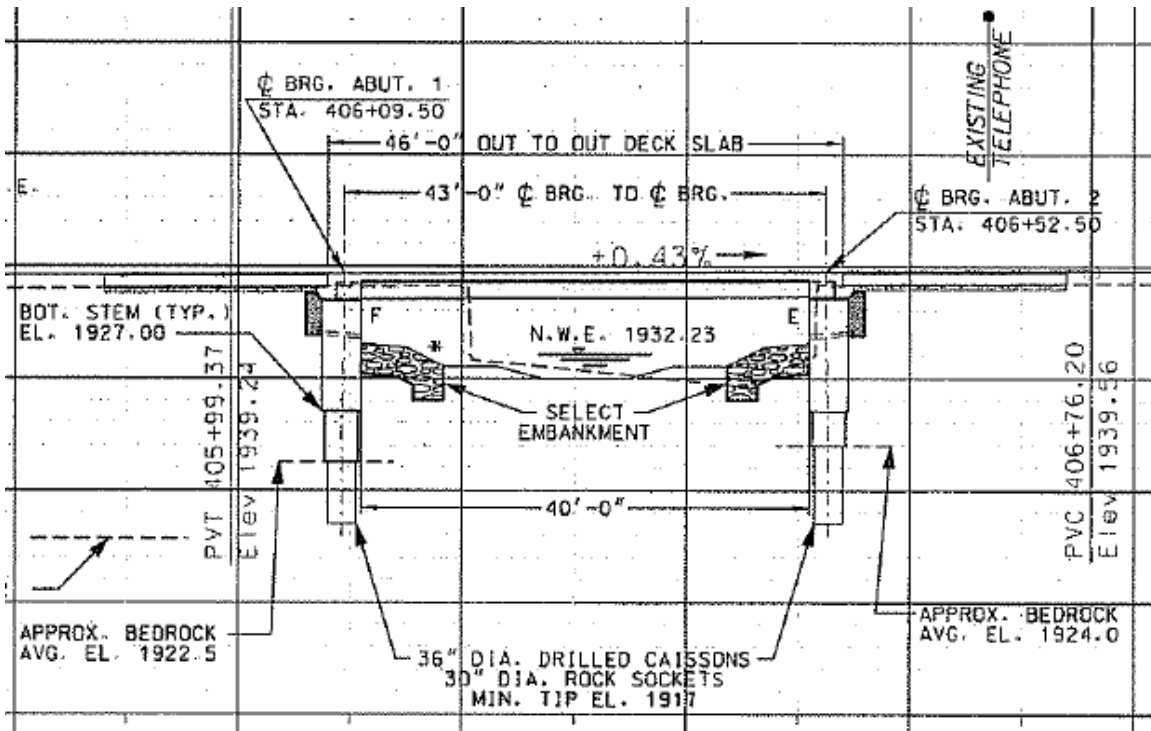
Profile of Stalnaker Run Bridge replacement, as indicated in construction plans.
